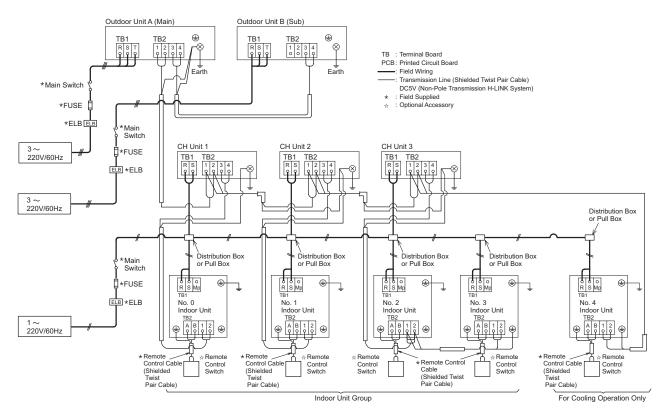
Instruction for Electrical Wiring Connection (Heat Recovery System)
